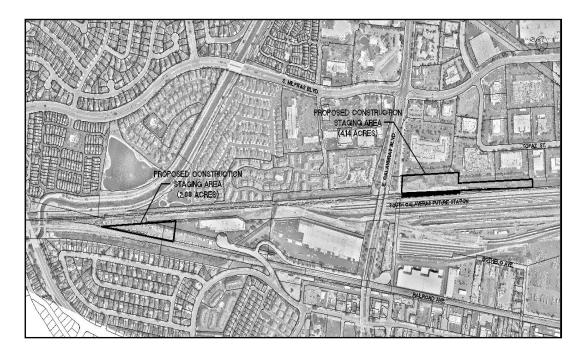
(a) Construction Staging Site between Railroad Court and Rail Corridor and (b) Construction Staging Site Adjoining Rail Corridor South of the Abel Street Overcrossing
